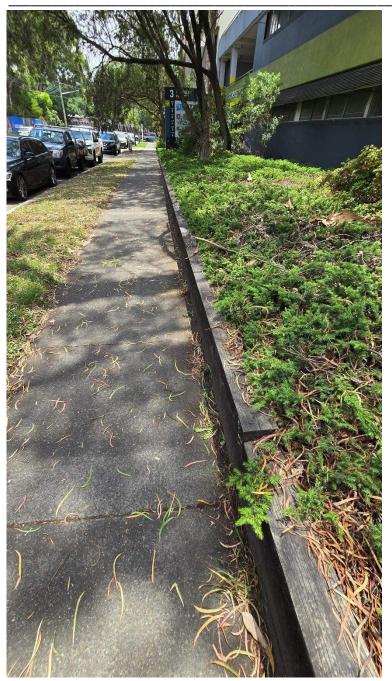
Cracks observed (20) - Retaining wall leaning outwards
